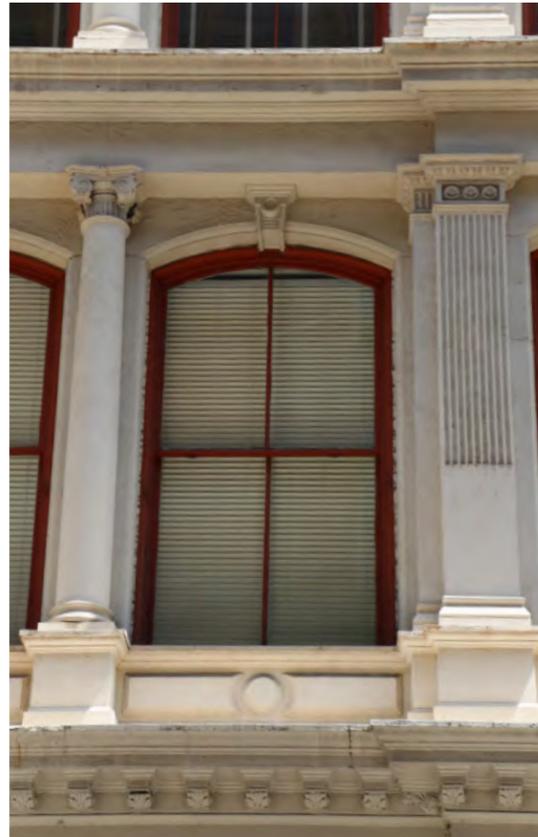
2nd floor. Double-hung sashes were previously replaced in kind and are in good condition.
